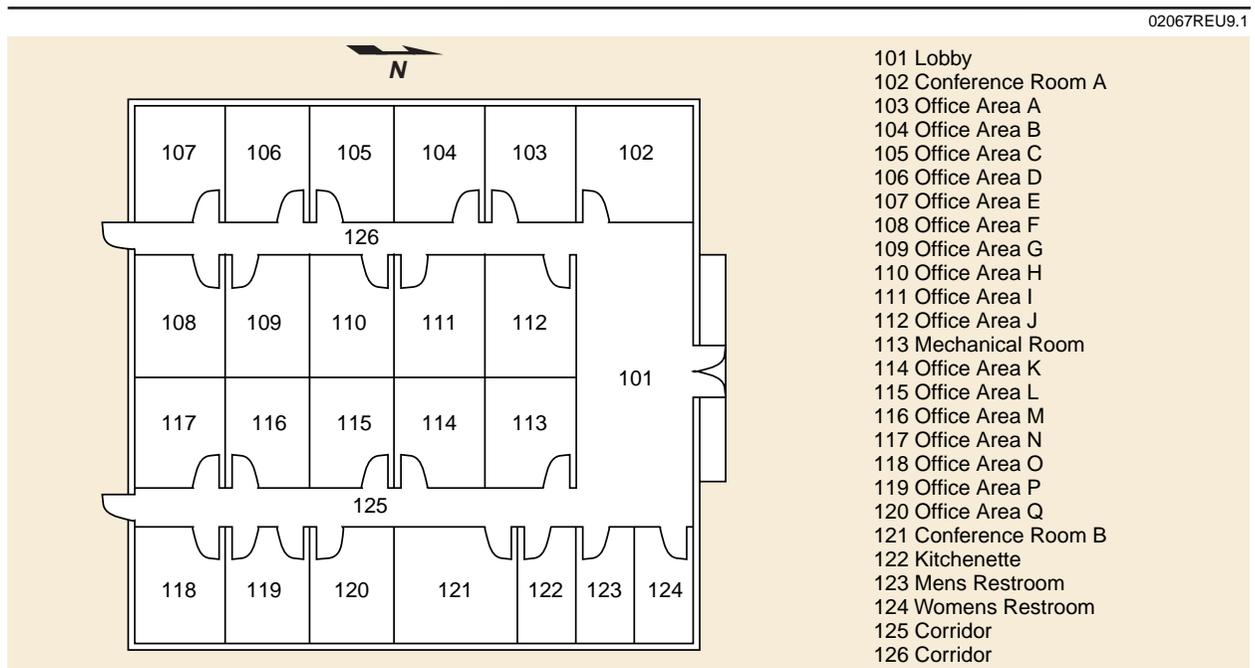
Building 5 Detailed Floor Plan, Astrotech
